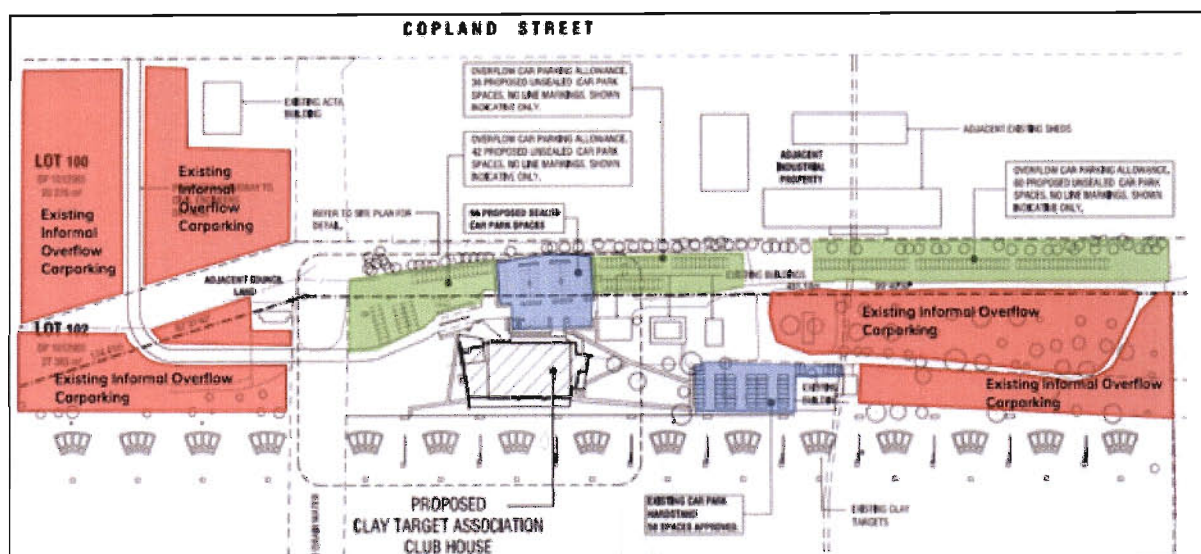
Draft Traffic Management Plan (SP, GHD & Icono Building Design 2017)
